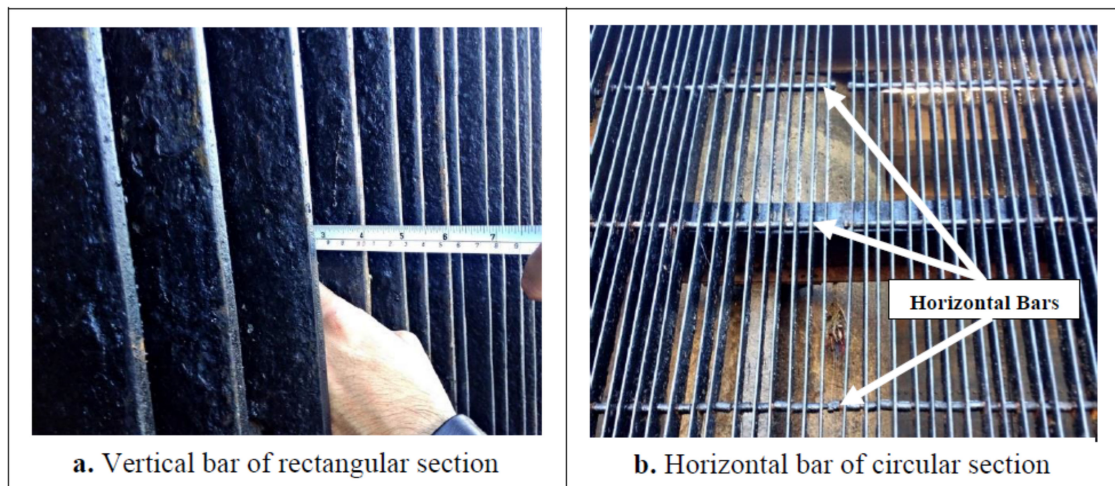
Vertical and horizontal bar profiles of trash racks screen at a hydropower station.
